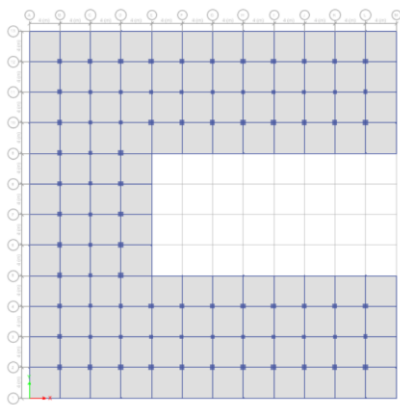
(b) Floor Plan of C-Type Hexagrid Structure
